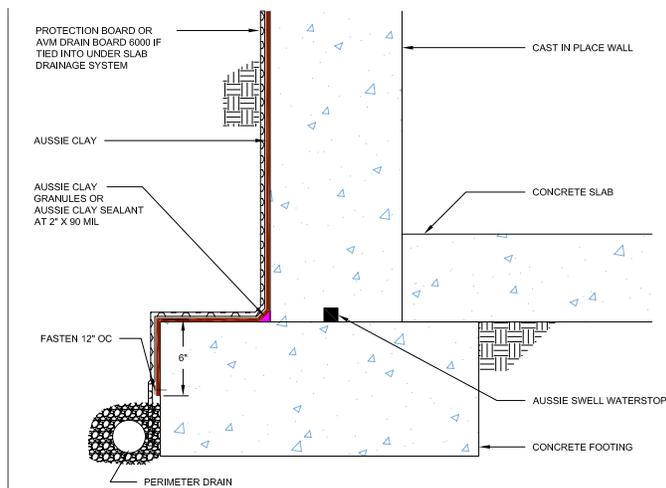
NON-HYDROSTATIC SLAB ON FOOTING
